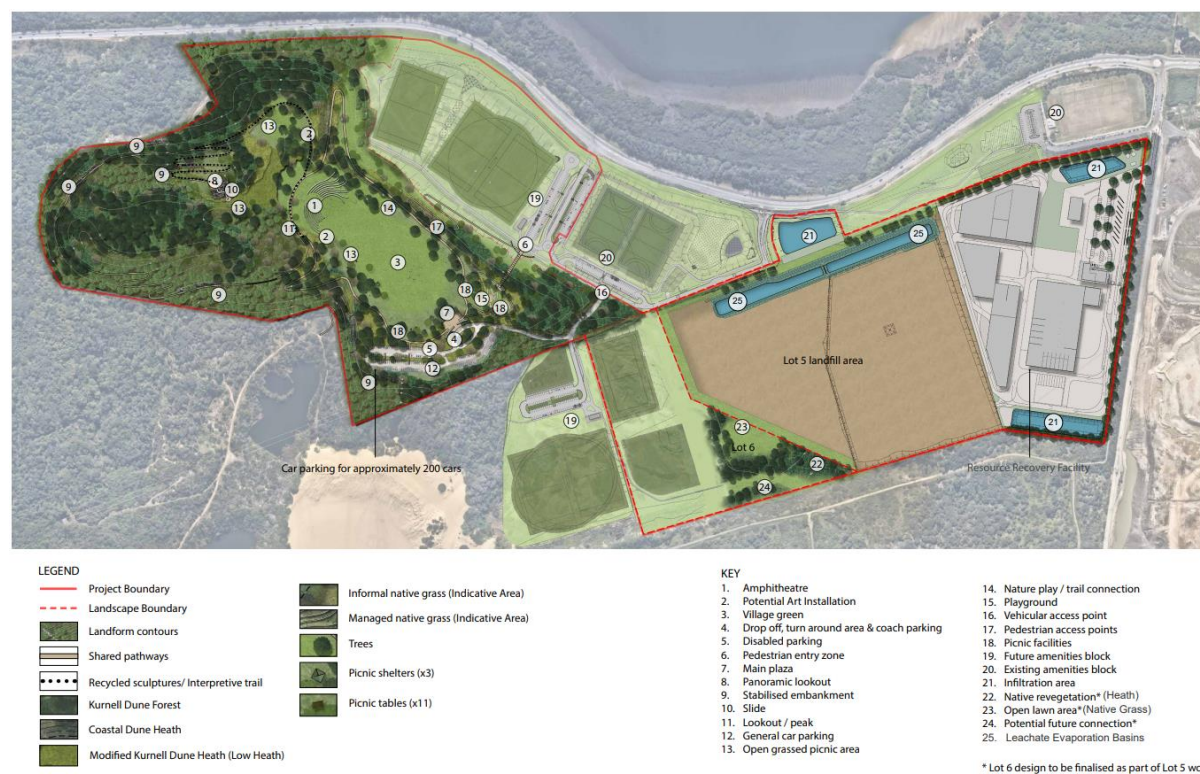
Site Layout Plan for Marang Parklands and Landfill Area
